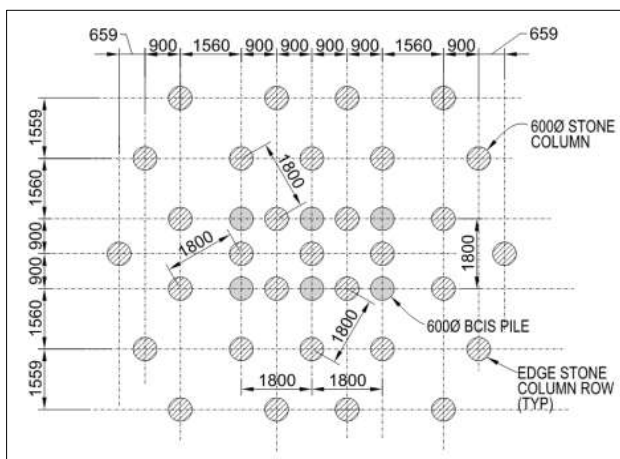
Initial stone column test layout for individual and group of stone column
